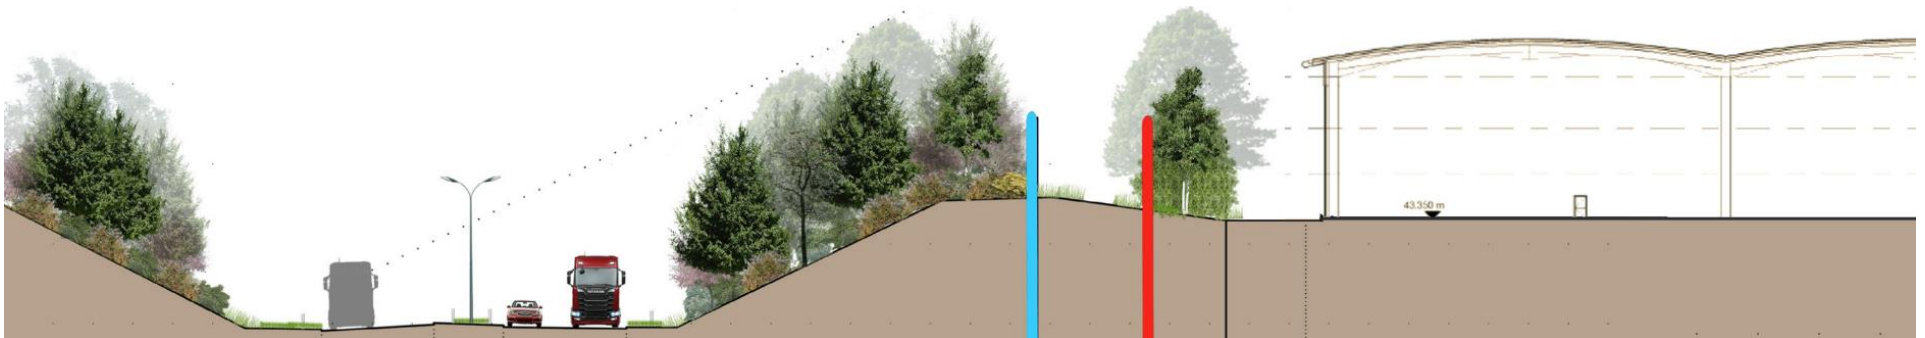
Sectional drawing east-west through A1120, vegetated bank and Plot 2000 building
